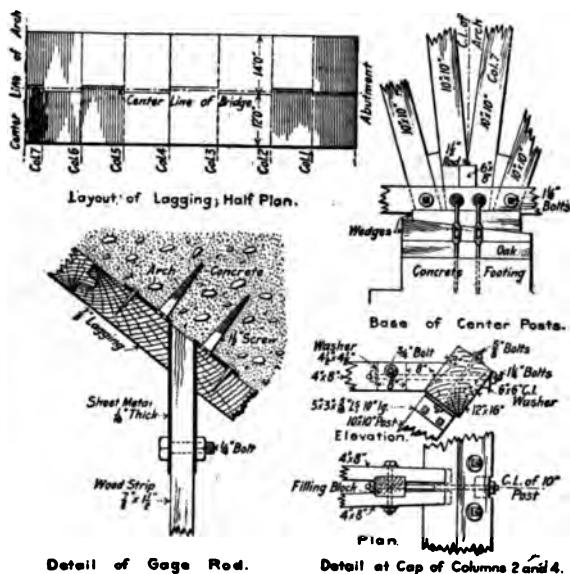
Special Details of Centers for Piney Creek Bridge.
